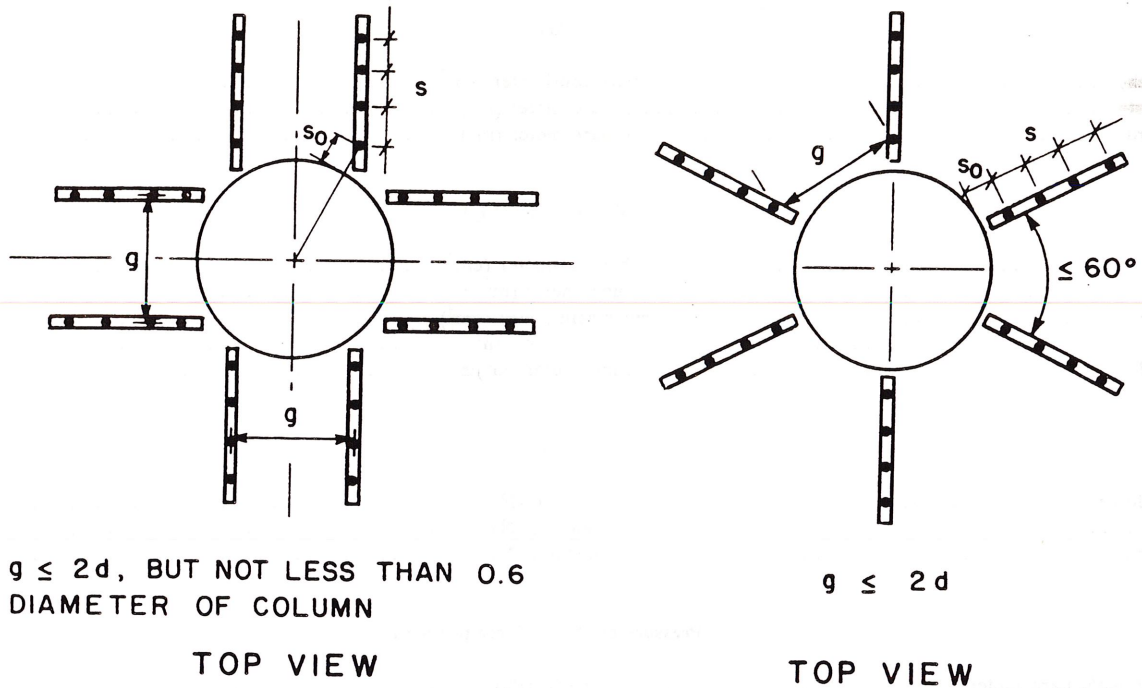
Stud shear reinforcement arrangement for circular columns
